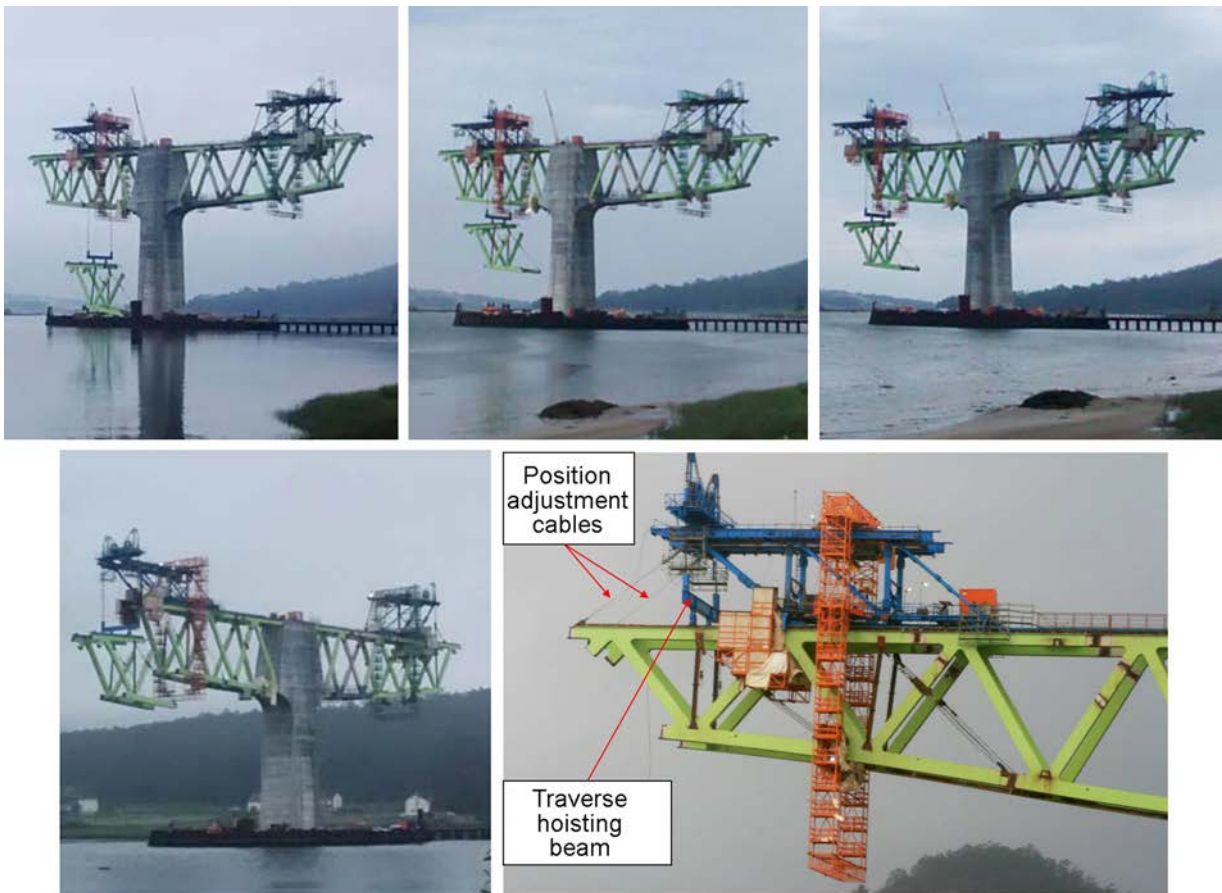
Hooking, hoisting and moving a segment with a mobile derrick crane; hoisting to permanent elevation and details of the transverse hoisting beam and segment alignment cables.
